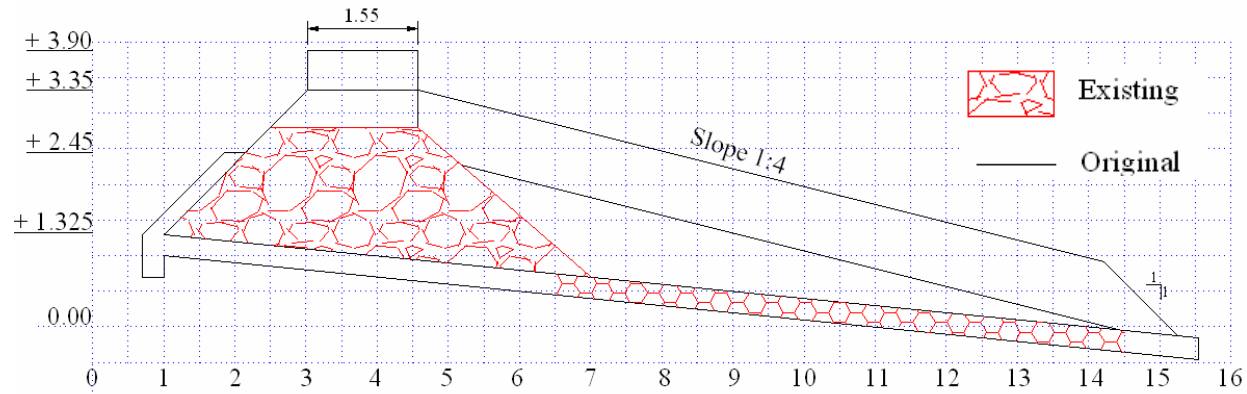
Cross-section of existing seawall at Maravukkadu
